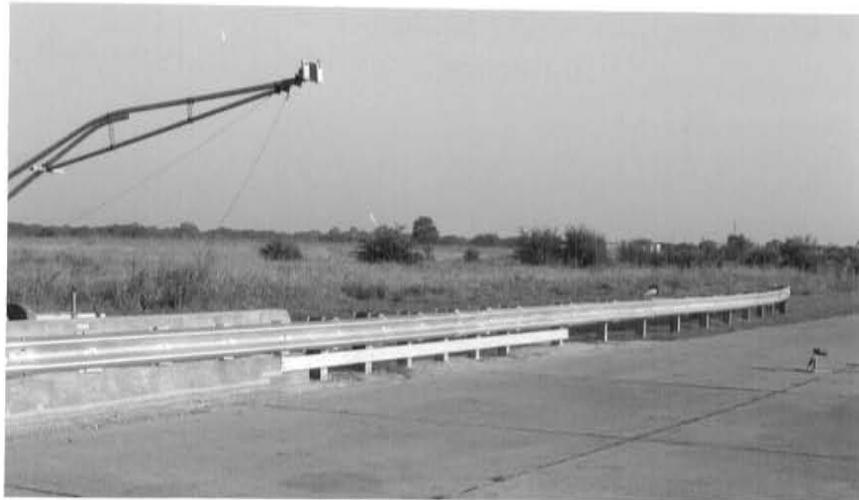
Arizona guardrail transition to concrete barriers before test 7155-1
